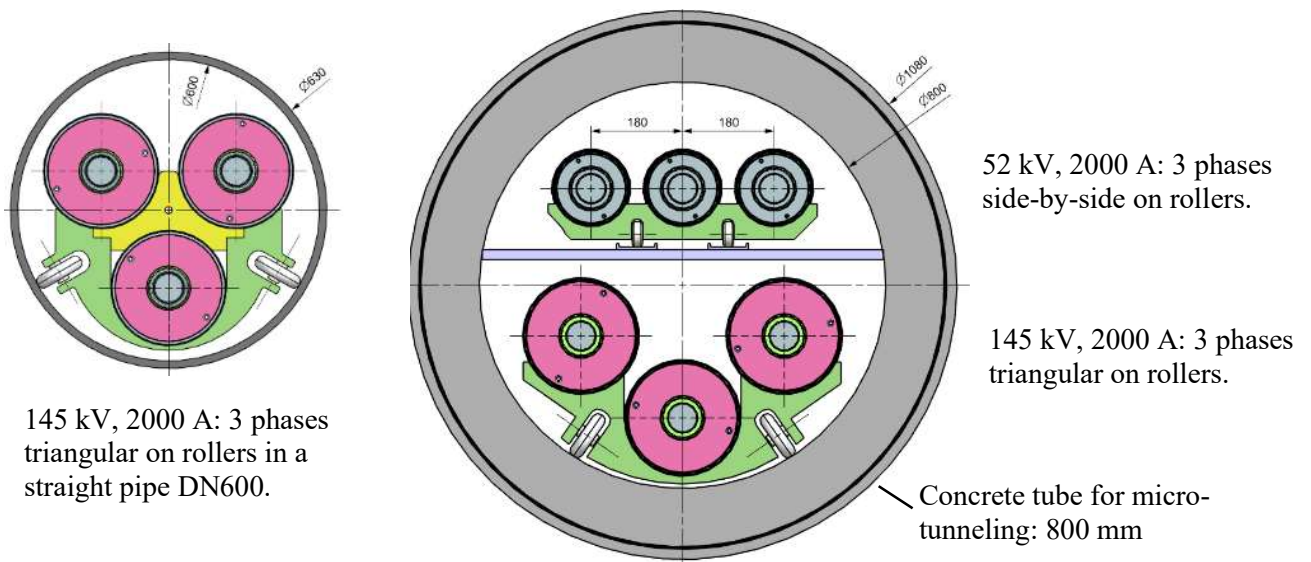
Dimension examples: PAC arrangements in pipe (left) and micro-tunnel (right).
